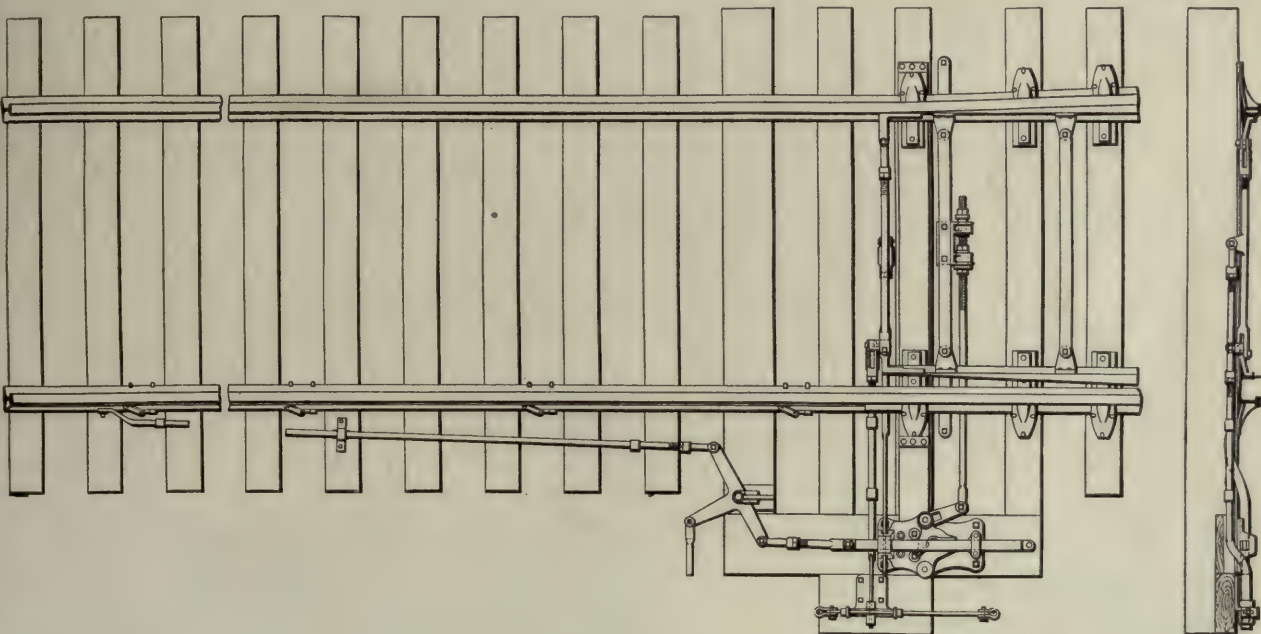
Switch and Lock Movement, Switch Fittings and Bolt Lock. Detector Bar Ahead of Points.
